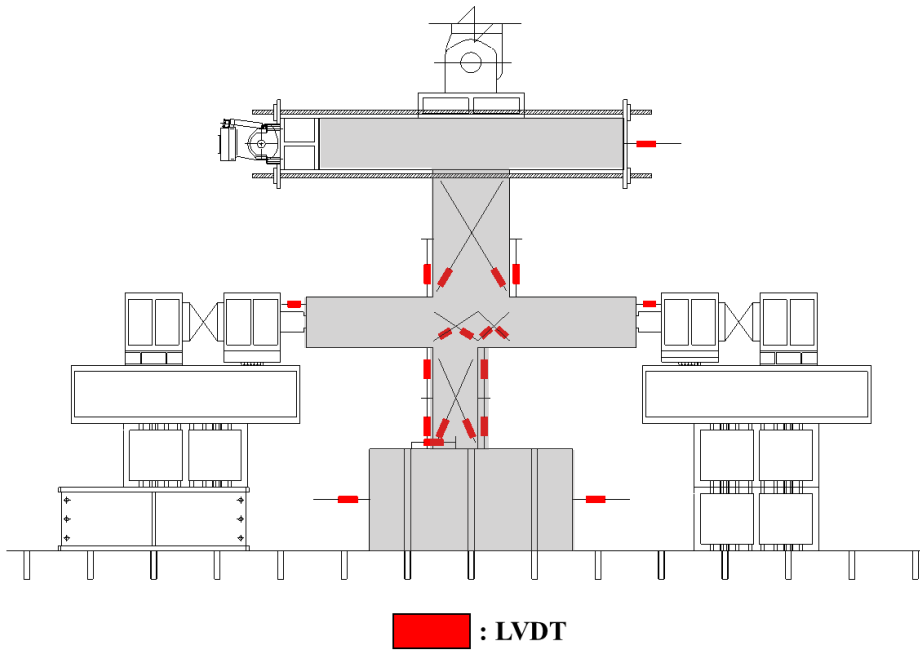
LVDT plan for specimen with in-plane lateral support
